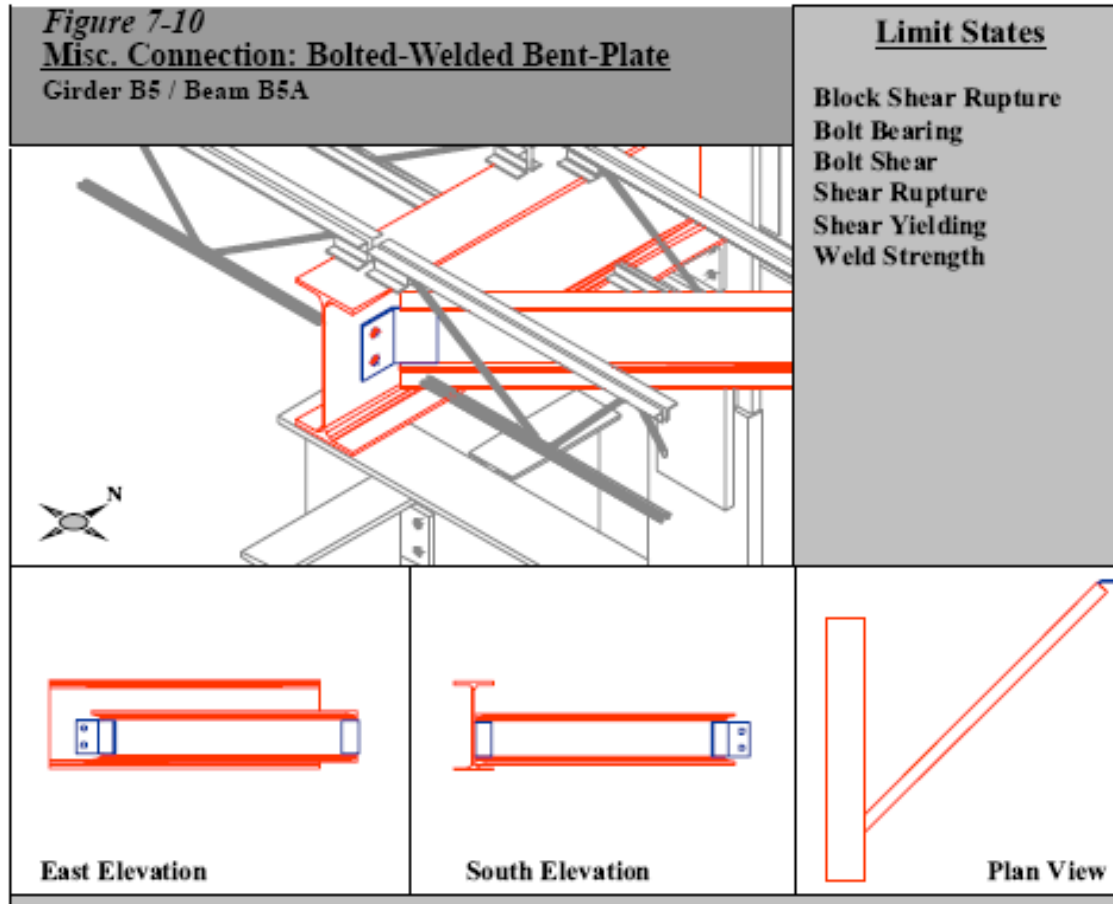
Misc. Connection: Bolted-welded bent-plate.
